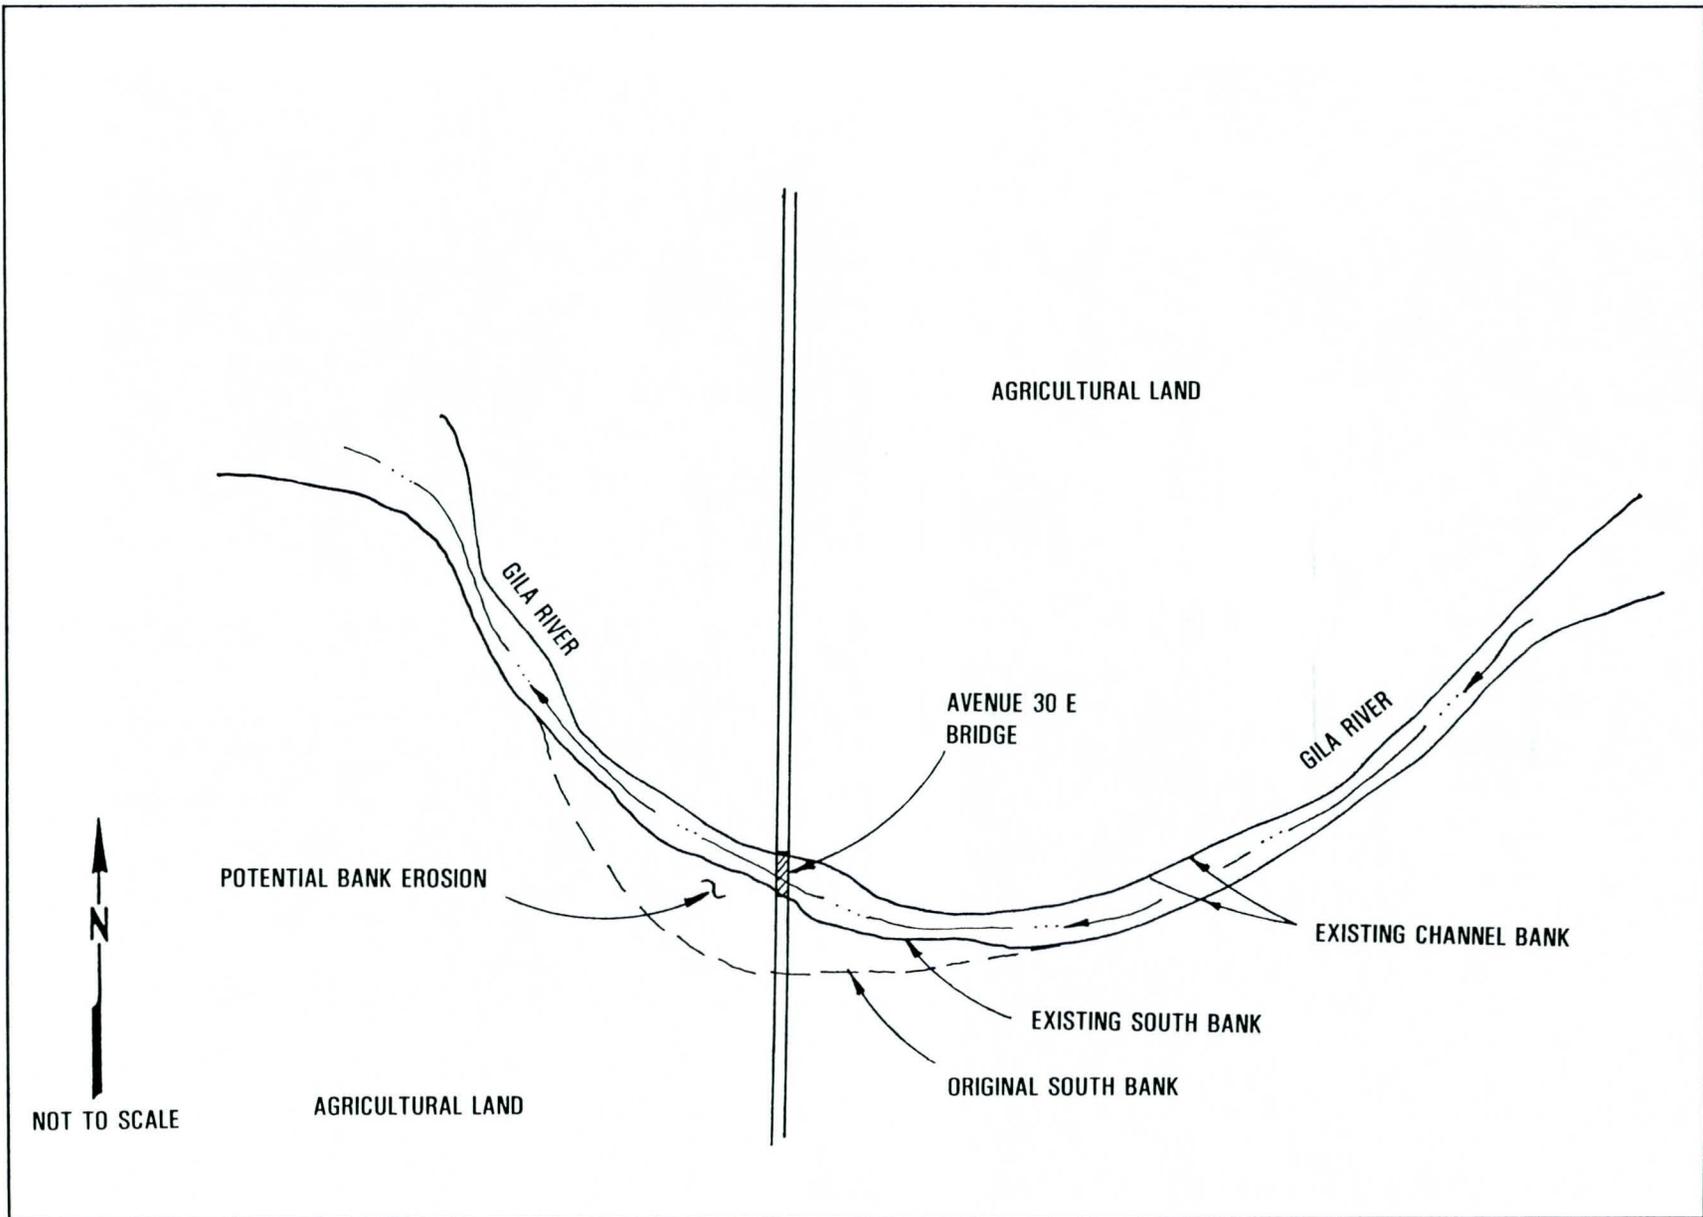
An Illustration of the Avenue 30 E Bridge Crossing
